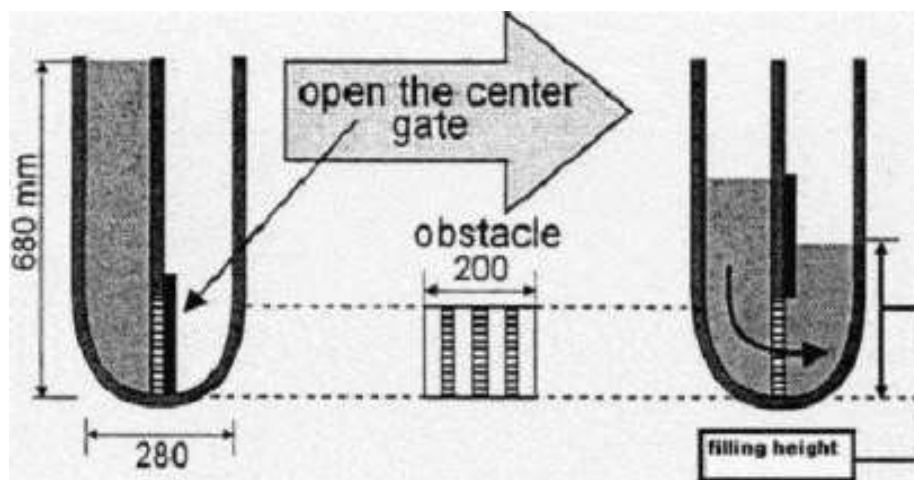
, U-Shaped Apparatus and its Arrangements
